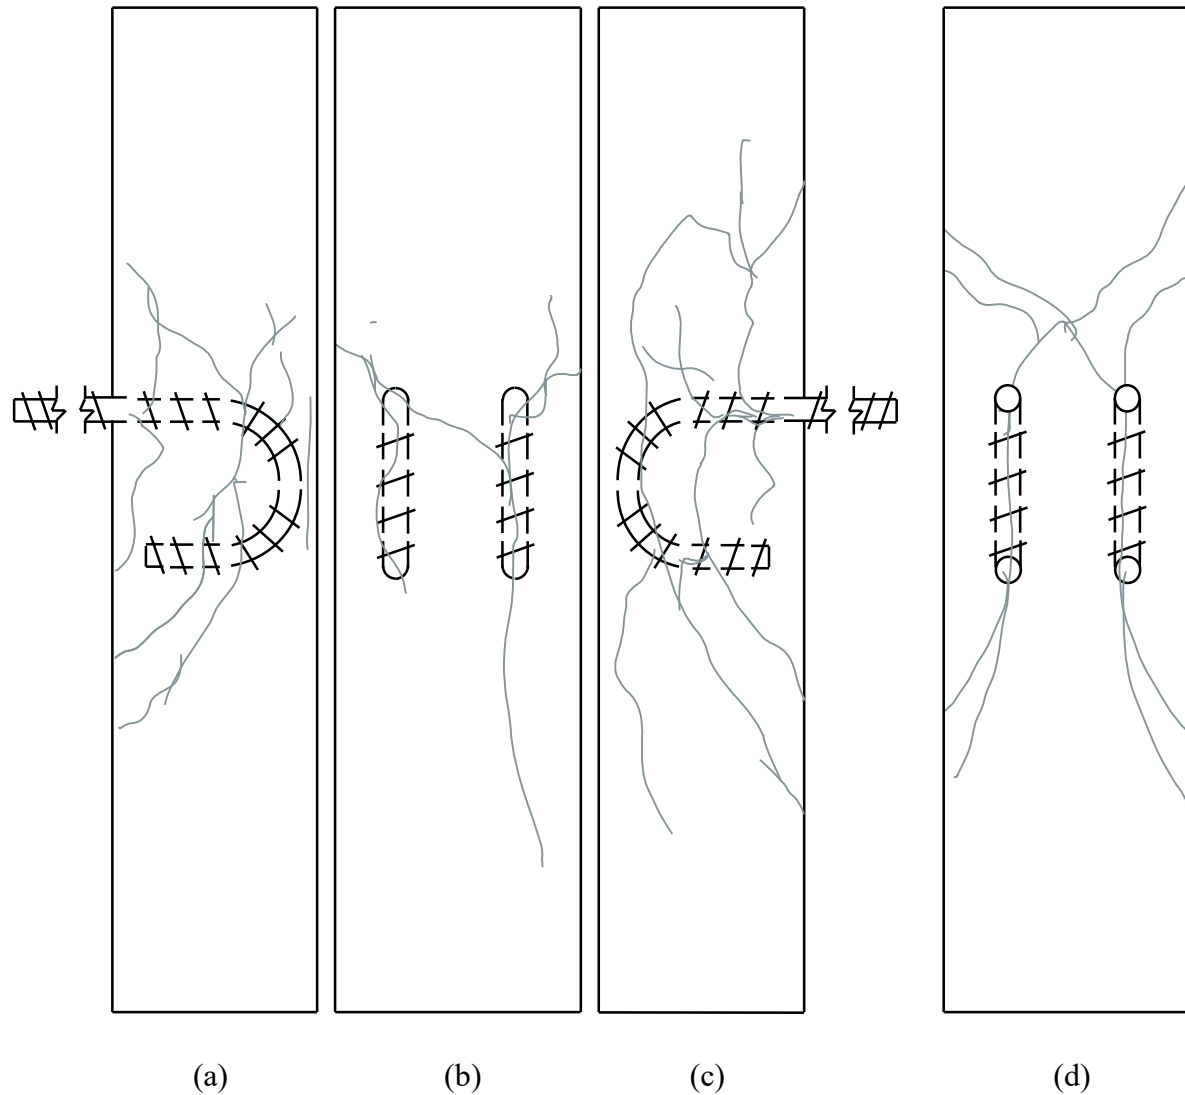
Crack pattern at maximum normalized tensile load for beam-column joint specimen MD1-180: (a) west side face, (b) back face, (c) east side face, and (d) front face
